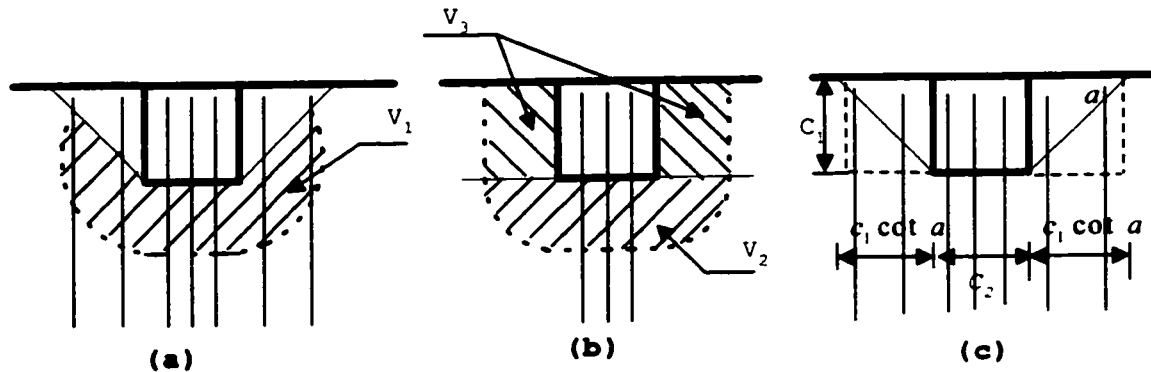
Column connected to slab at one face as starting point of Regan's approach.
